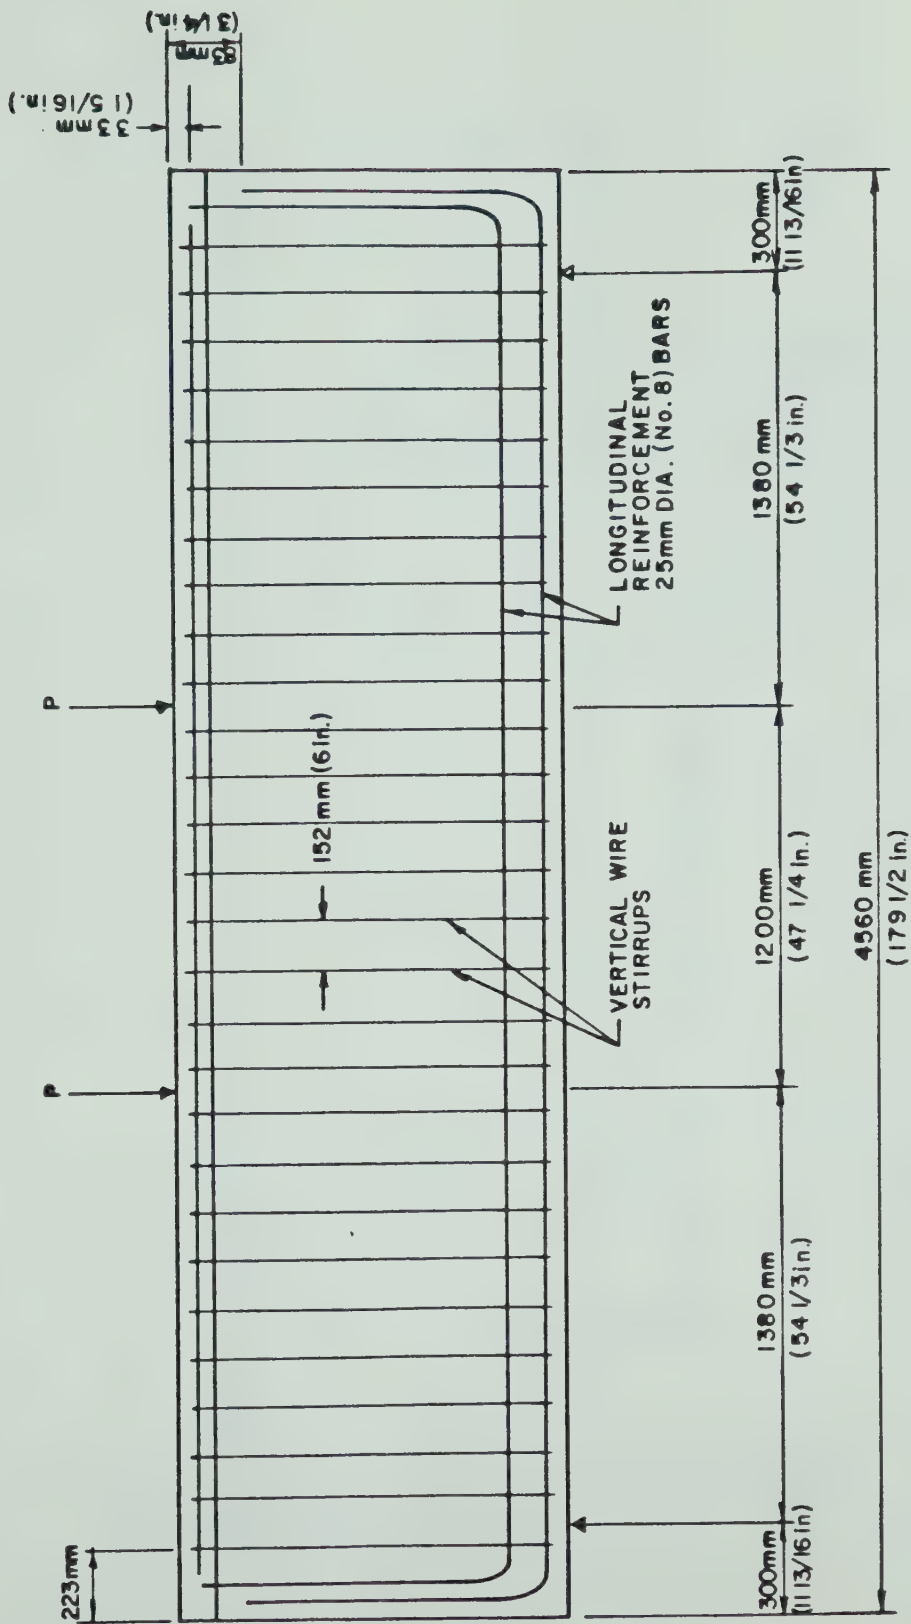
Beam Elevation Showing Reinforcement Layout with WWF Web Reinforcement
